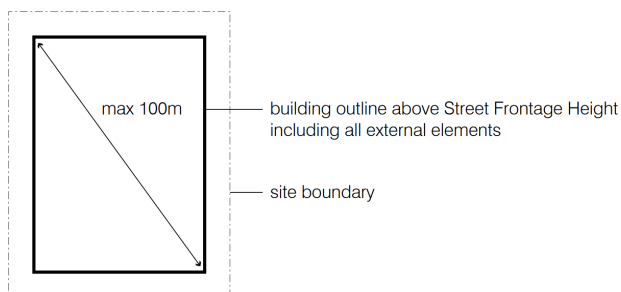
Maximum horizontal dimension of a non-residential building above Street Frontage Height
